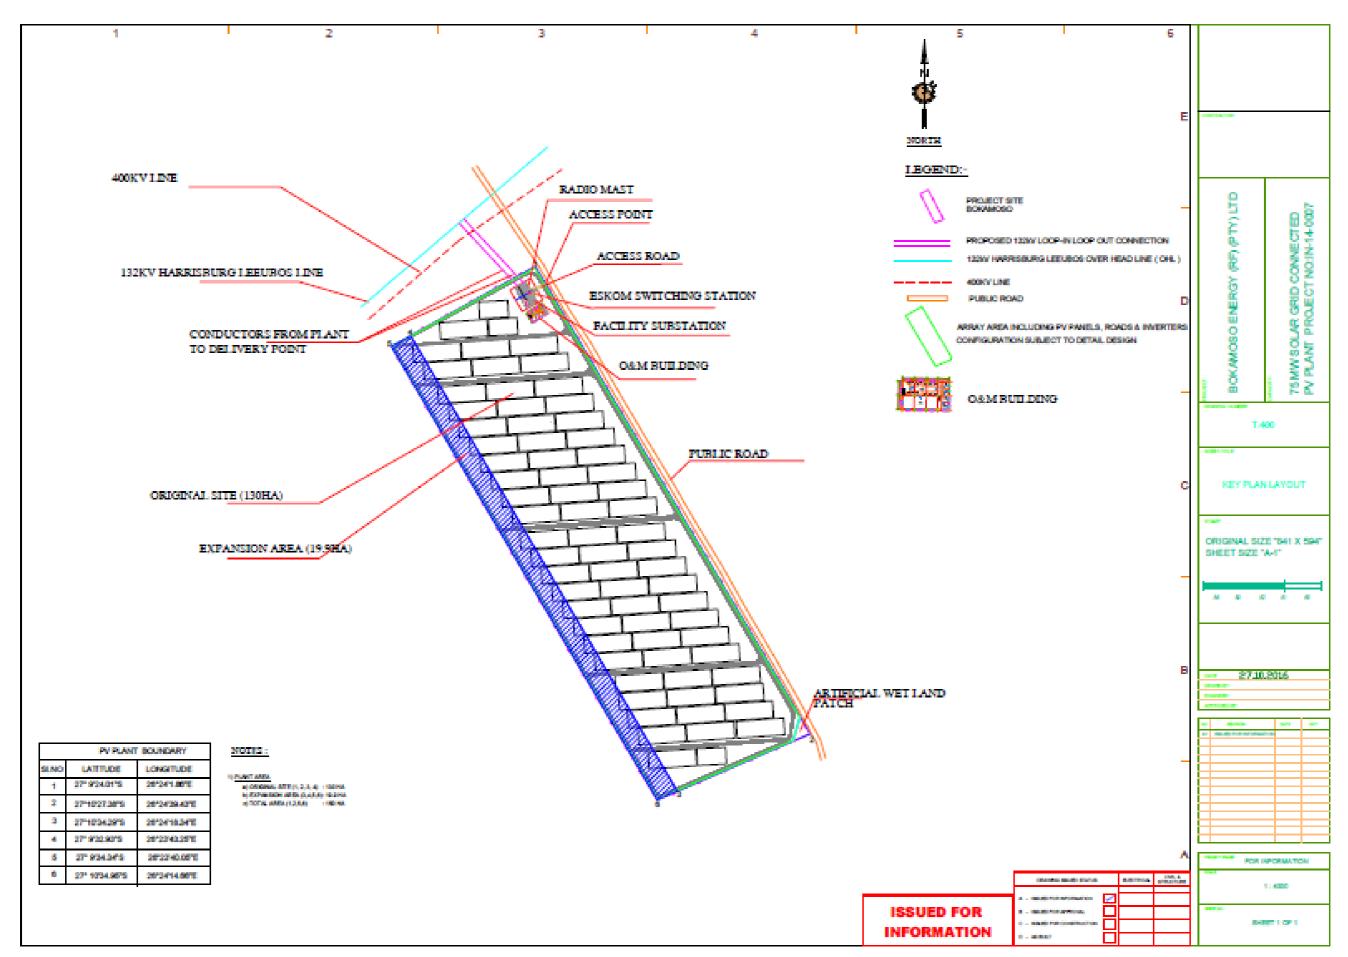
Layout plan indicating site boundary, plant boundary and internal roads
